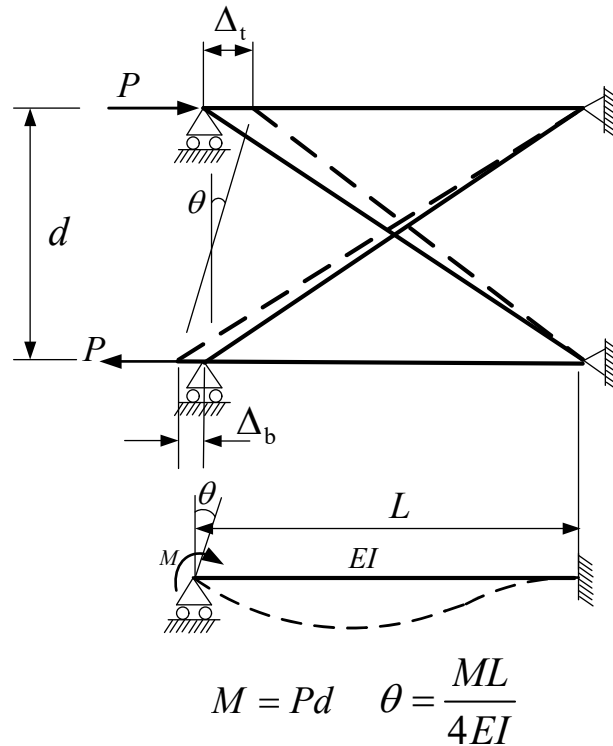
Equivalent beam analogy for modeling cross-frames in a grillage superstructure model (AASHTO/NSBA Steel Bridge Collaboration 2014)
